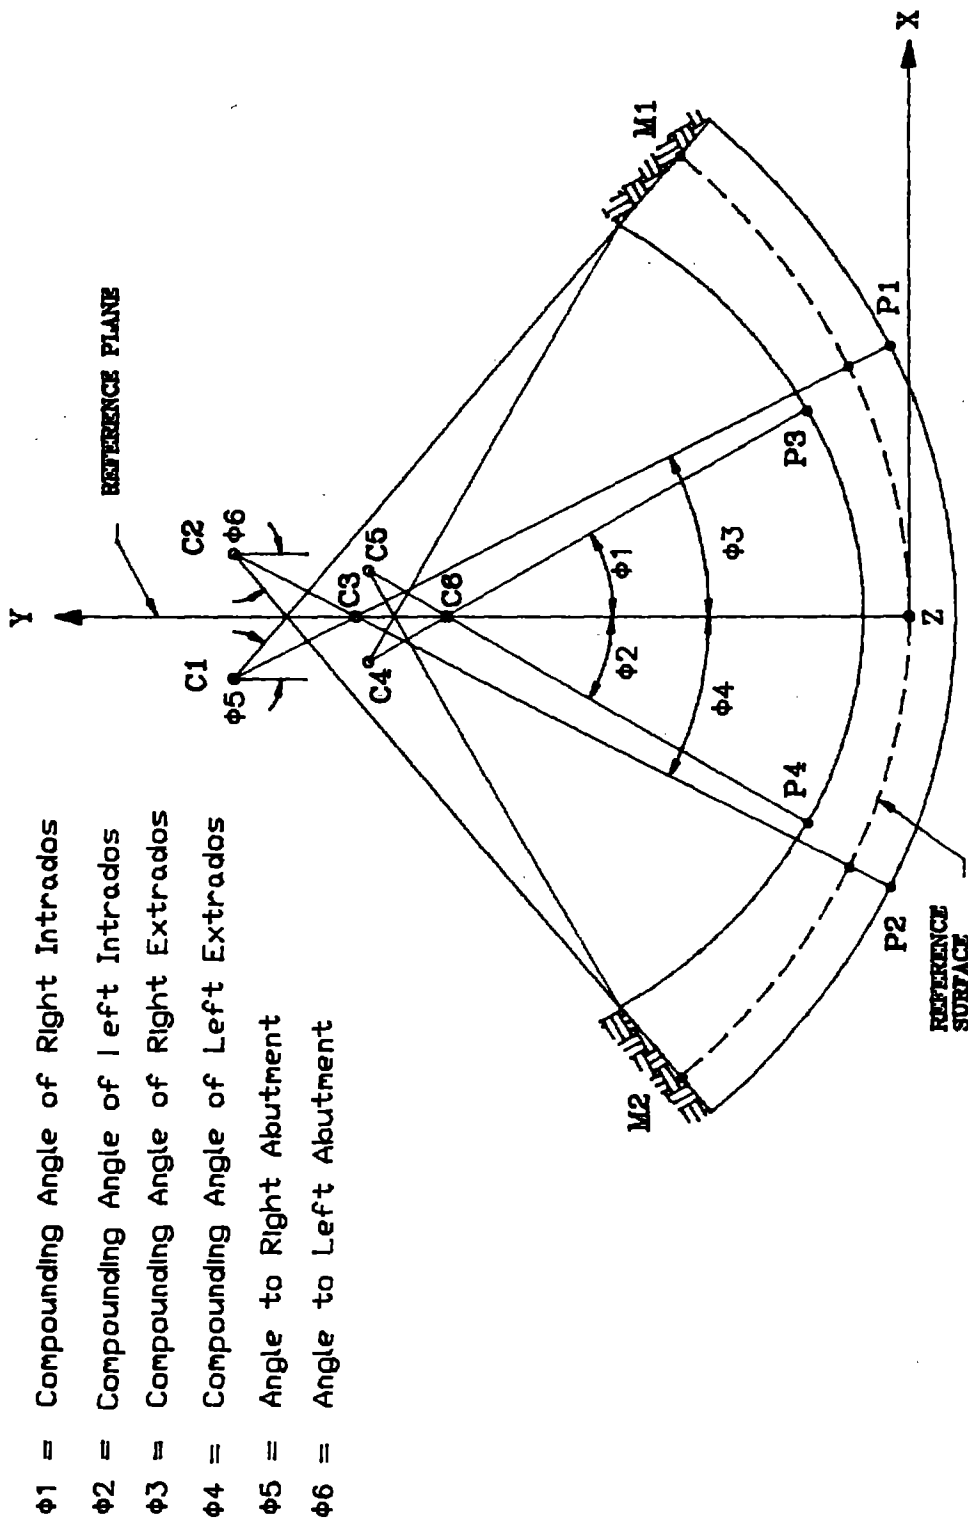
Typical Horizontal Section of a Three-Centered Arch Dam
